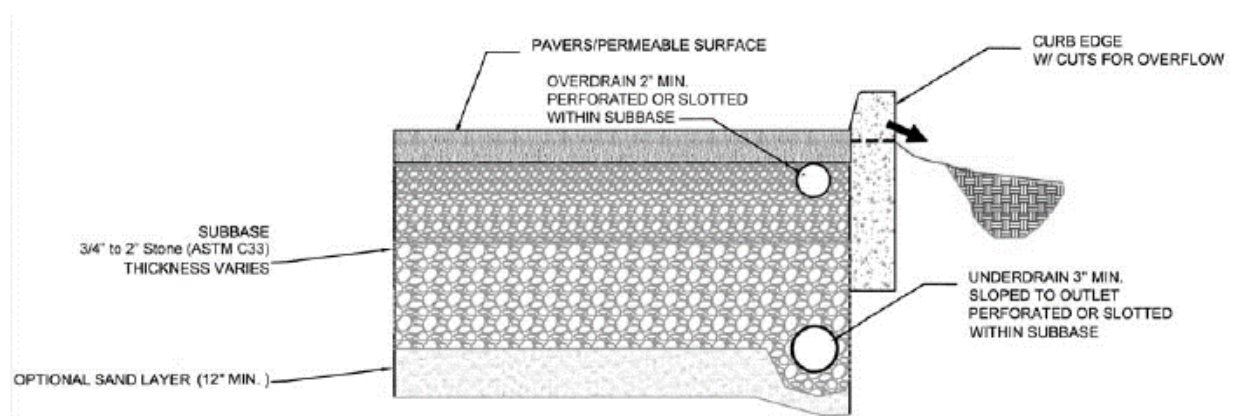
Cross section of a permeable pavement system. Source: MDE Stormwater Manual.
